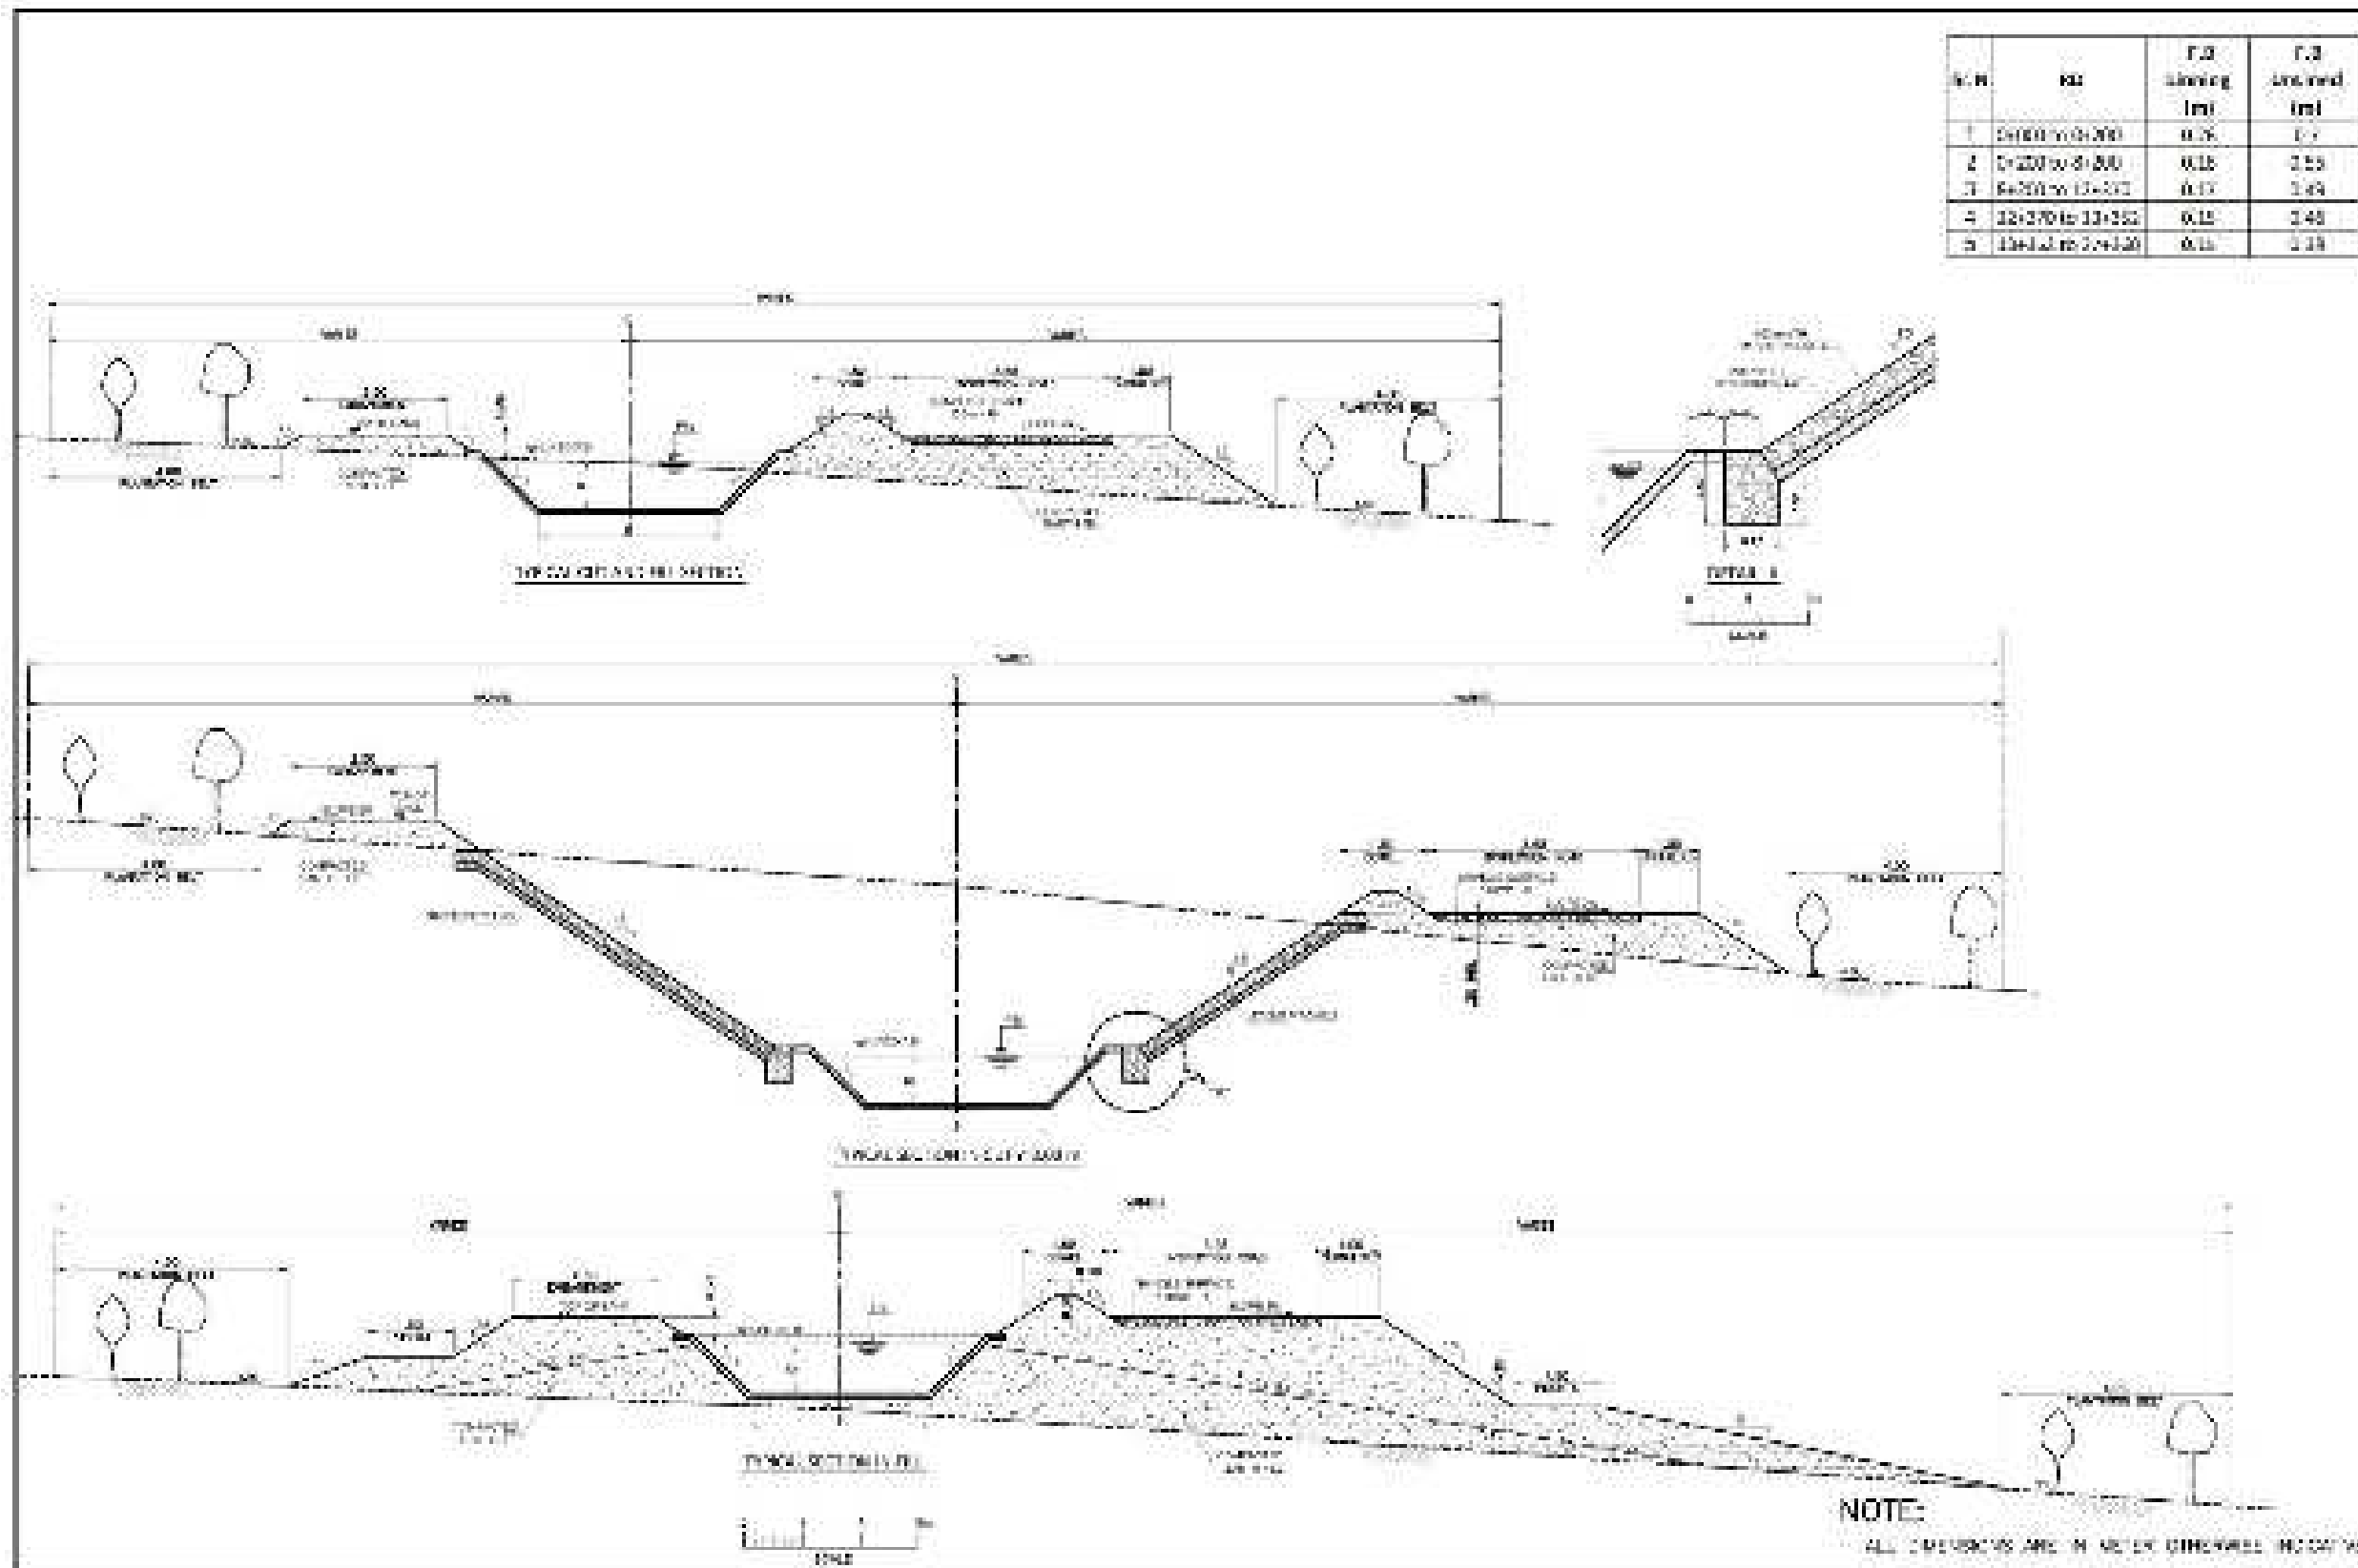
Typical Cross Section Indus Amber and Janda Boka
